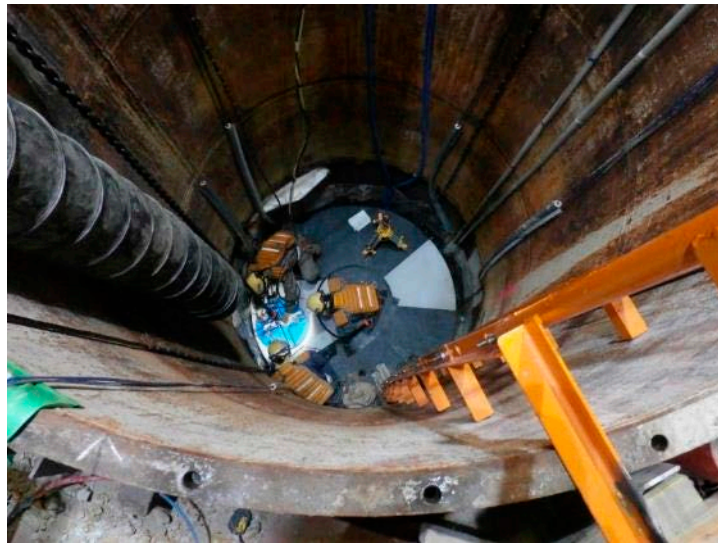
Setting buffer material block into test pit using vacuum grasp system
